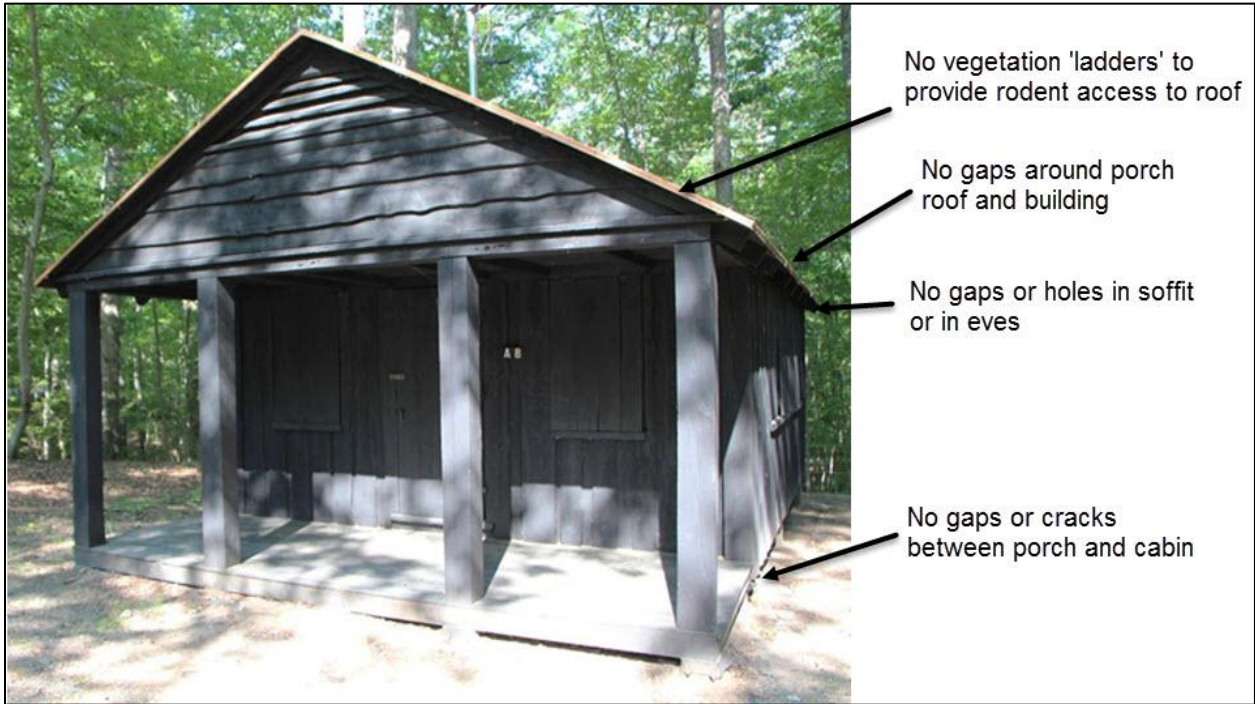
Examples of exterior inspection points on this cabin include: gaps around porch roof and building, gaps or holes in soffit or in eaves, vegetation ladders that provide rodent access to the roof, and gaps or cracks between the porch and cabin. Figure credit: NPS Figure.
